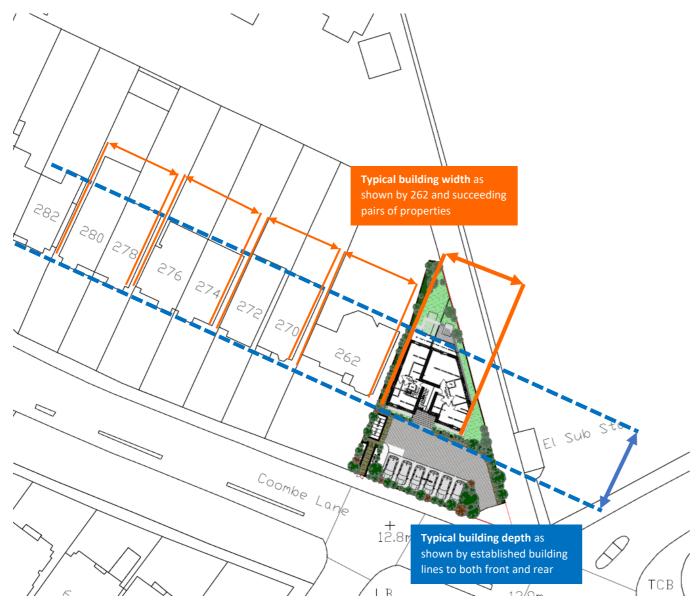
Proposed Block Plan of 260 Coombe Lane showing its similarity with neighbouring properties, in terms of building width and depth
